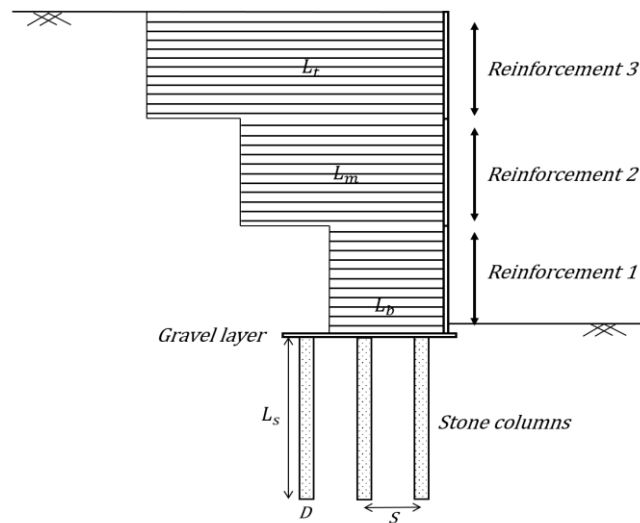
MSE wall with an uneven reinforcement length over the height in addition to stone column arrangement
